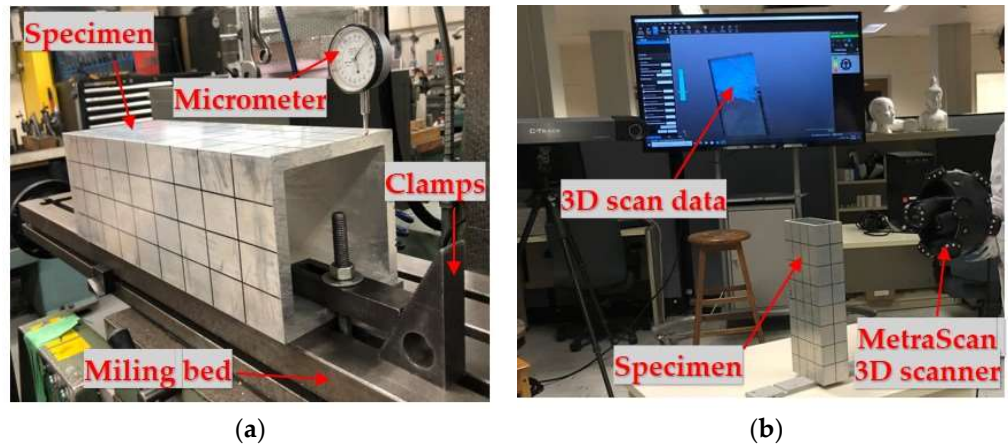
Geometrical imperfection measurements (a) by means of mechanical techniques, and (b) using MetraSCAN 3D scanner.
